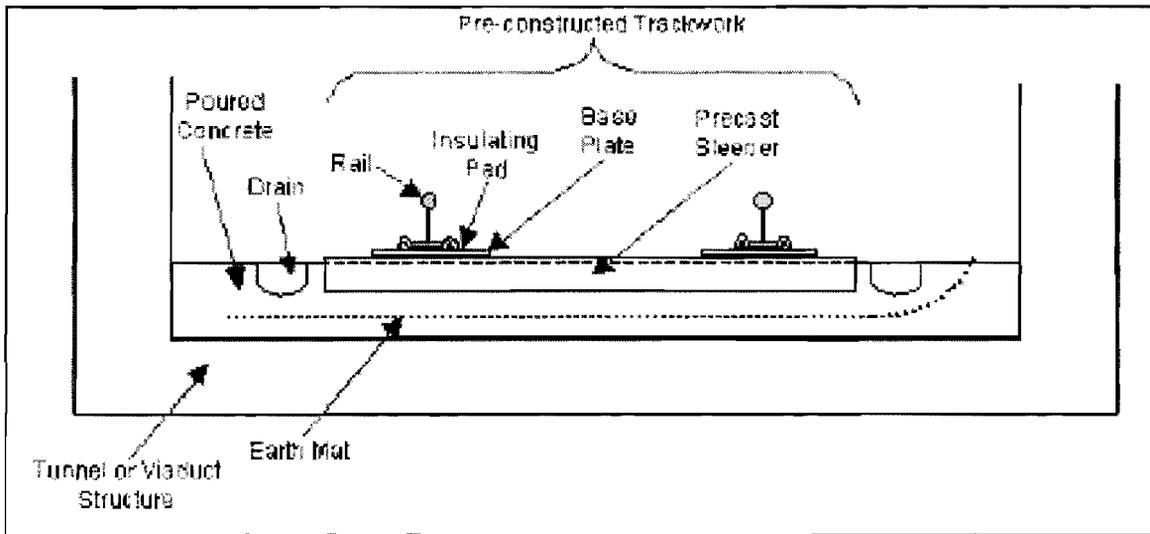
Modern slab track system, showing the pre-constructed track which is suspended in the structure while concrete is poured around it.
